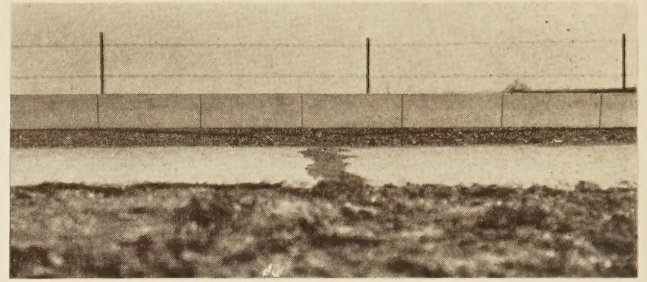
IMPACT REACTIONS PRODUCED ON A BITUMINOUS PAVEMENT BY SETTLEMENT OF BACK-FILL OVER A CULVERT PIPE
